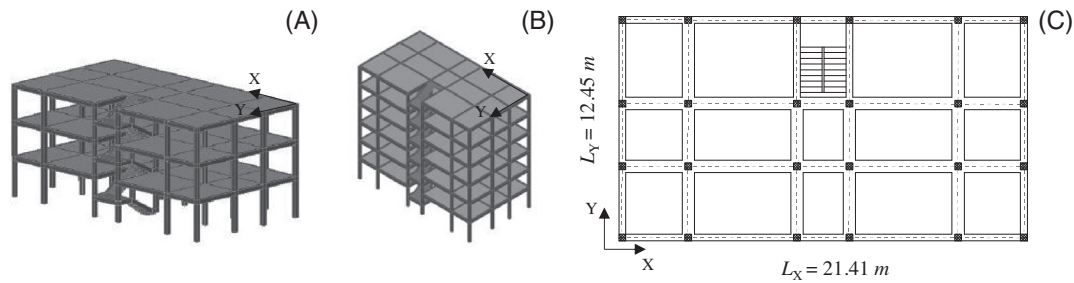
Configuration of the two case-study RC moment-resisting frame buildings: elevation of the three-storey (A) and six-storey (B) building and plan common to both (C). Main directions indicators X, Y also shown.
